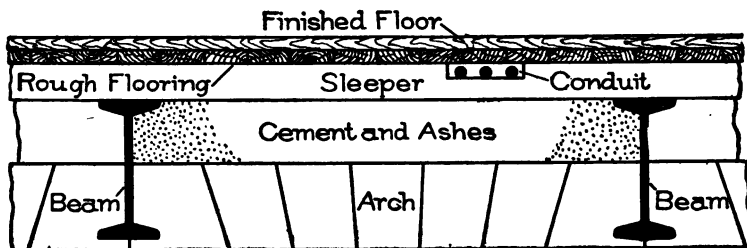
Running Conductors Concealed under Floor in Fireproof Building.
